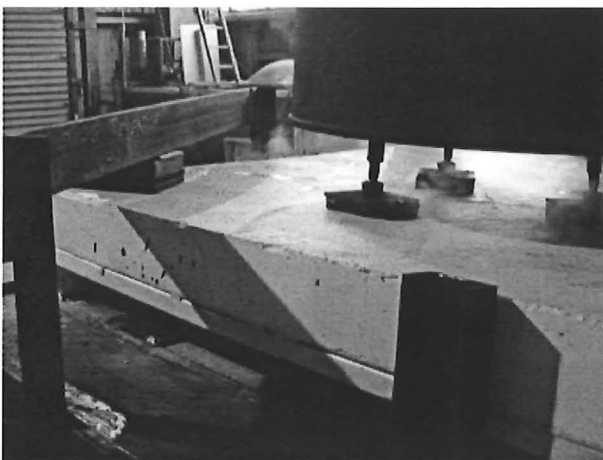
Steel flashings at the bottom side of the slab.
